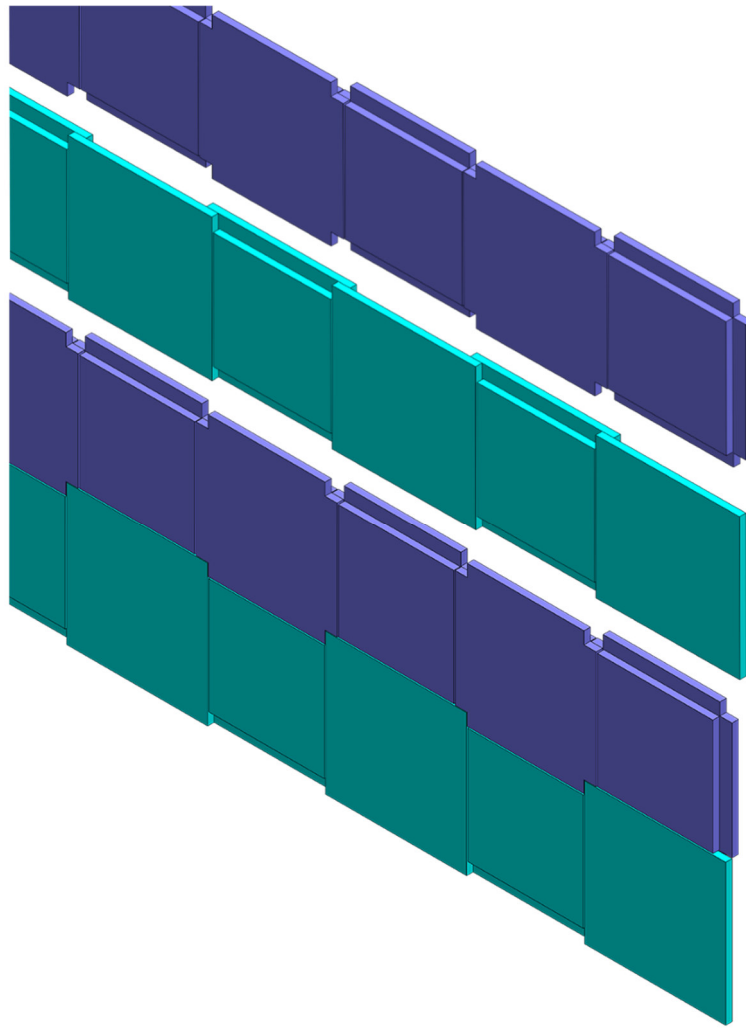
Assembly isometric view of the VIP modules (NIC 10)
